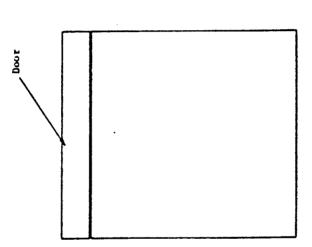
Shelter A Location Of Cameras No. 5 and No. 6 Outwide Of Shelter Viewing Door/Shelter Interface
